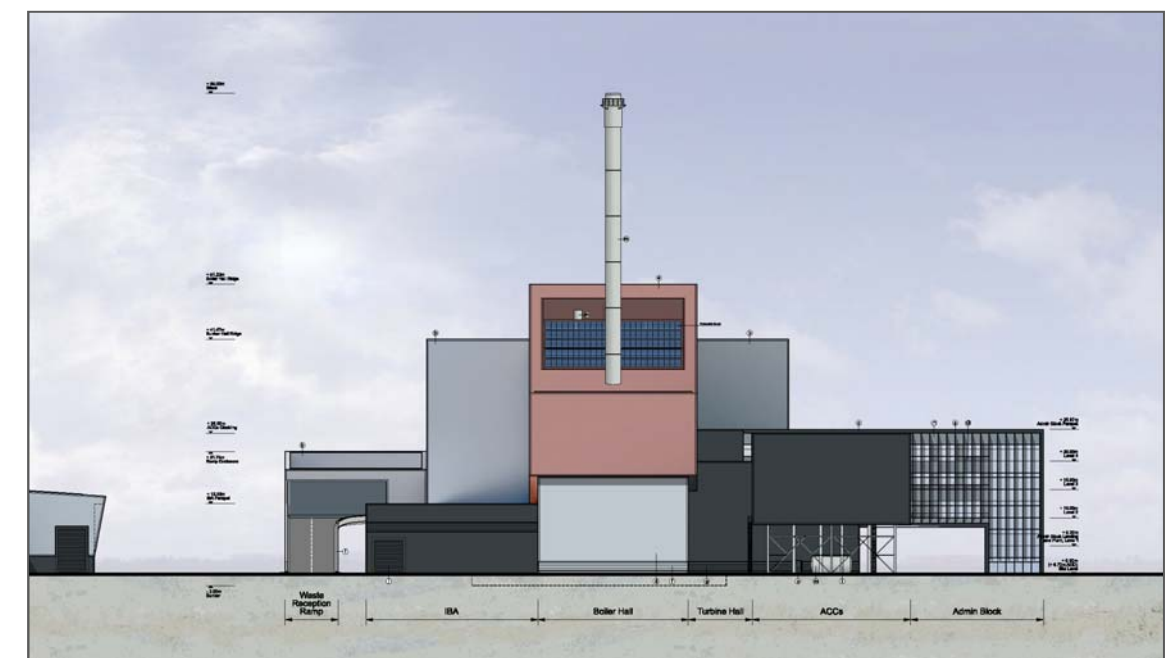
Proposed ERF south elevation – extract from drawing PL302
